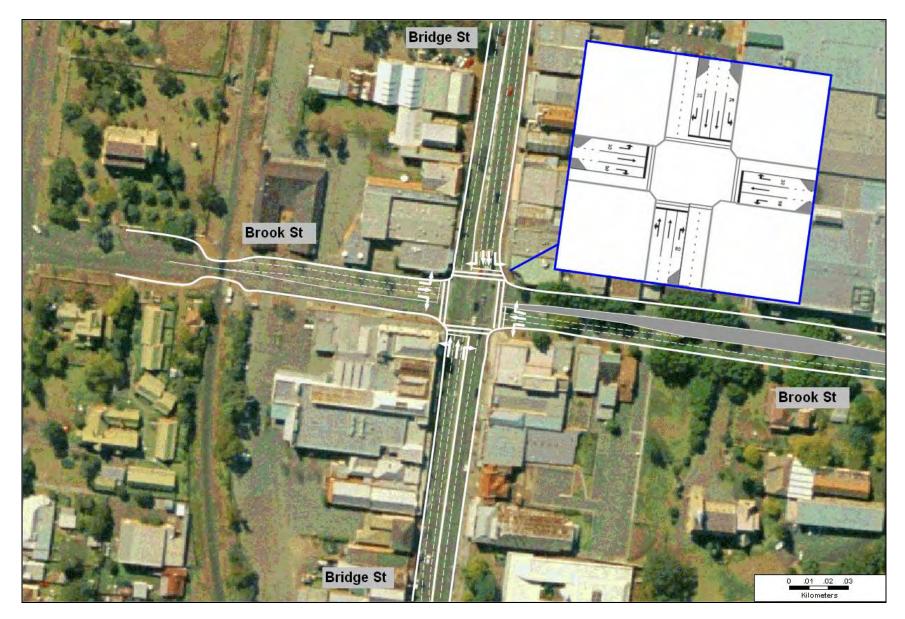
Intersection upgrade at Bridge Street/Brook Street (by extending the length of turn bays)
